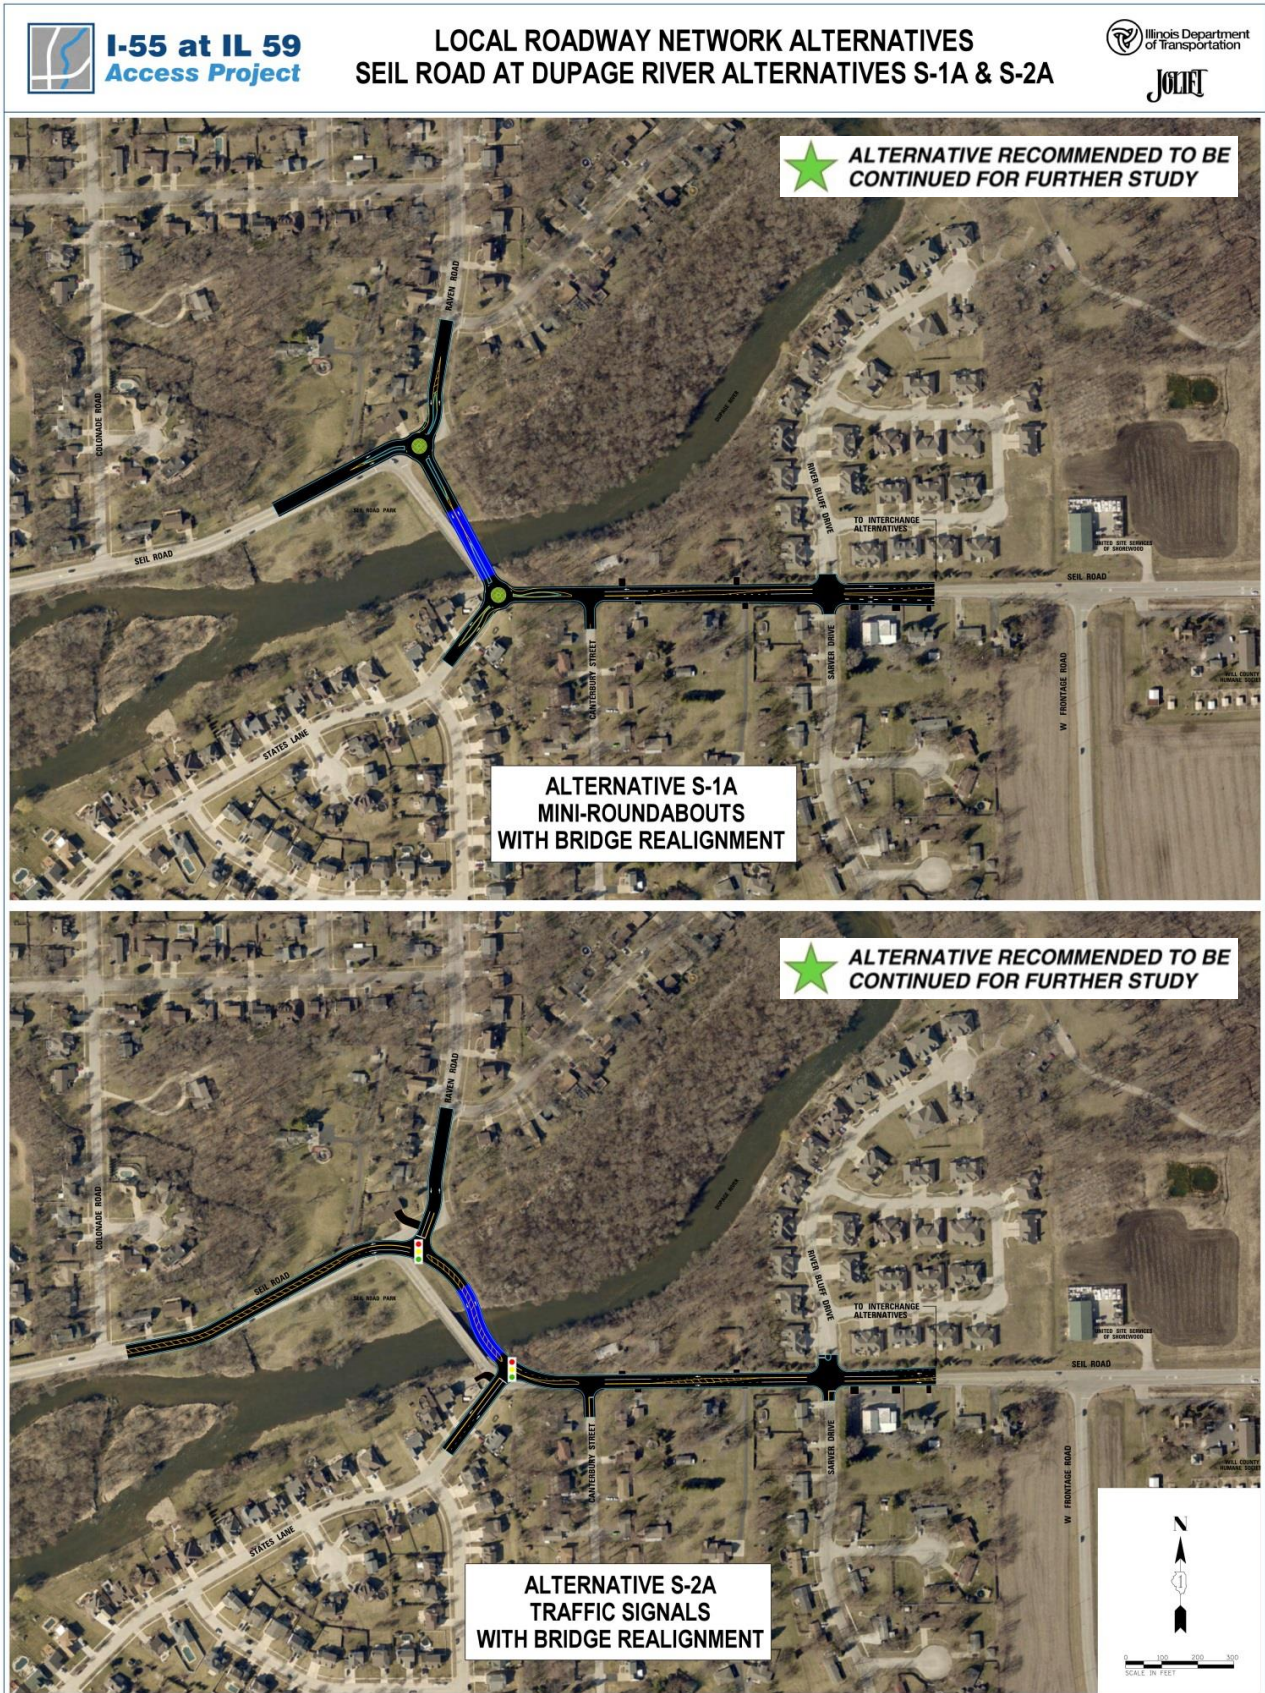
Seil Road Alternatives S-1A and S-1B Concept Plans
